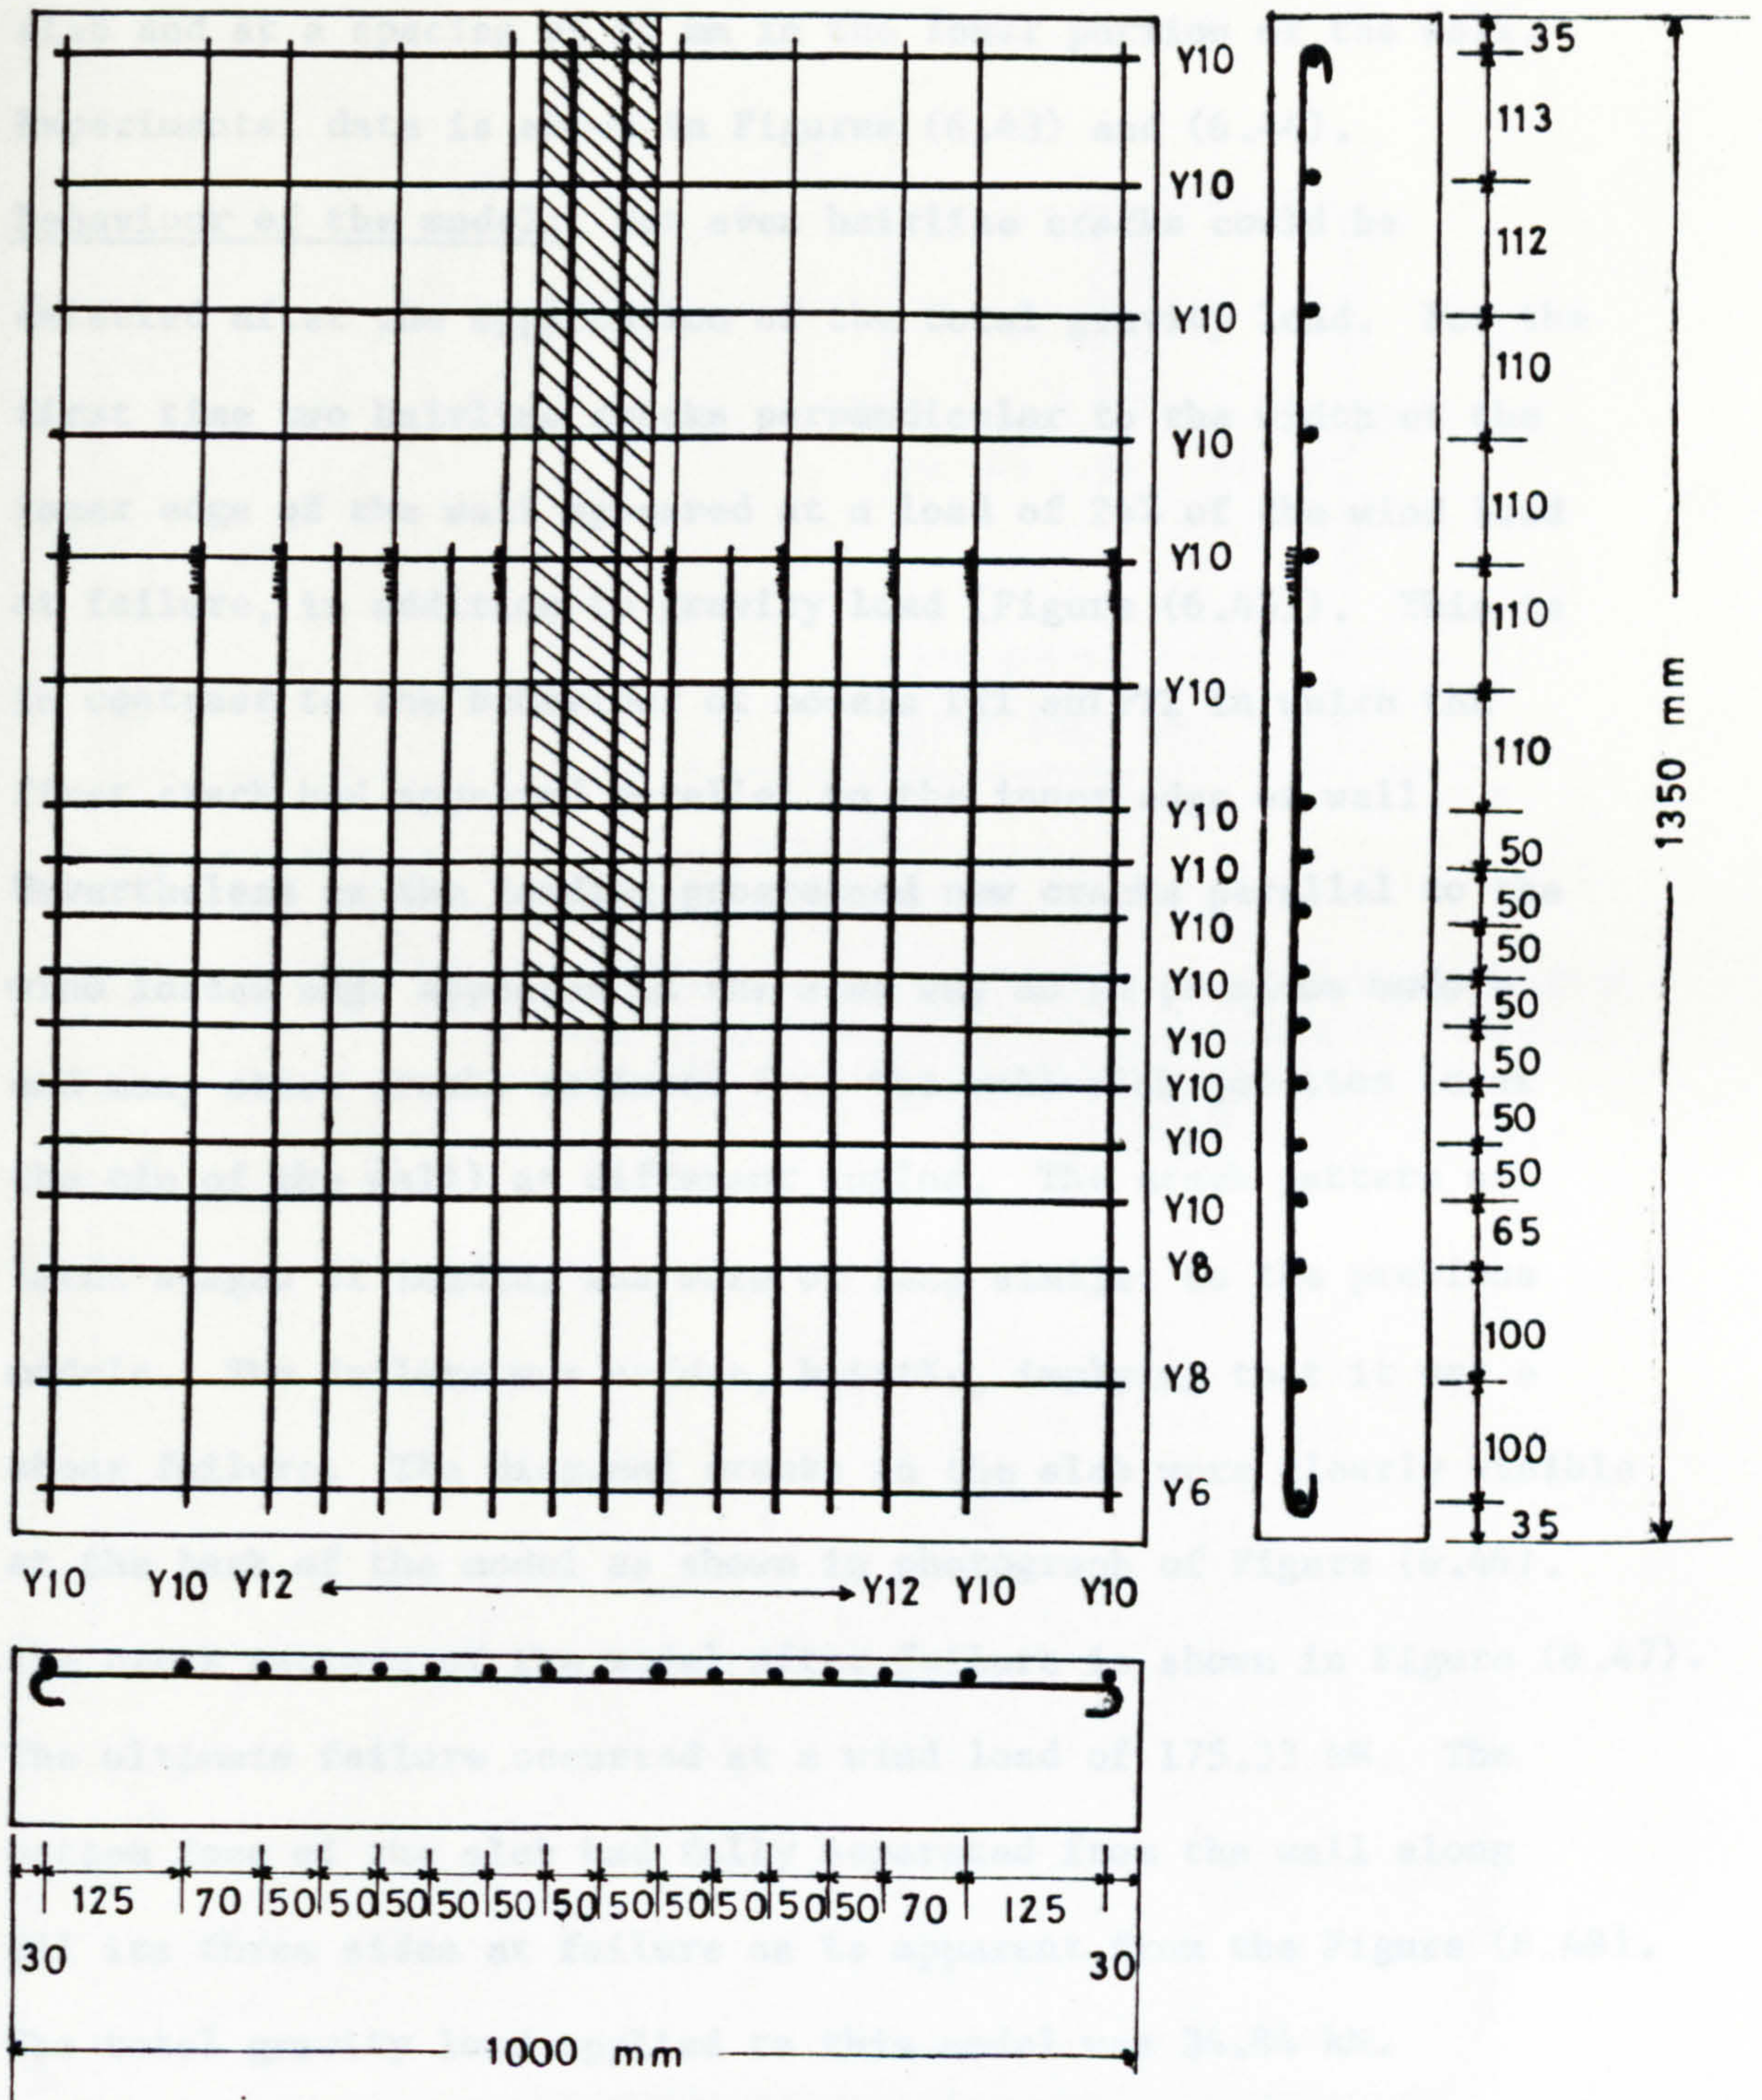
Arrangement of reinforcing bars in the slab of model MT1.
